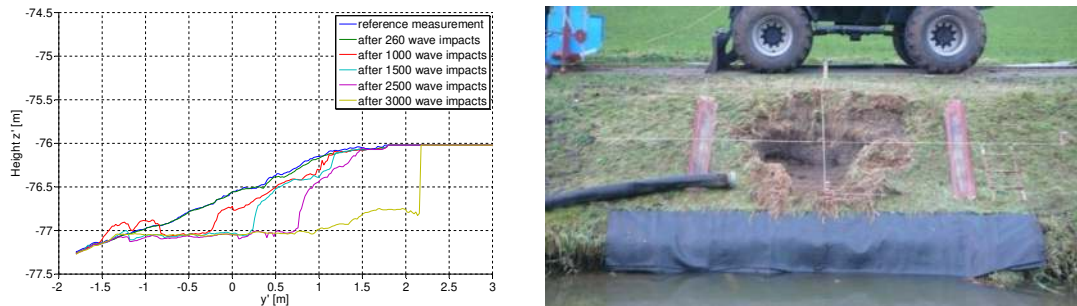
Test Section Ol.1. Left: erosion development, right: test section after 3000 impacts.
